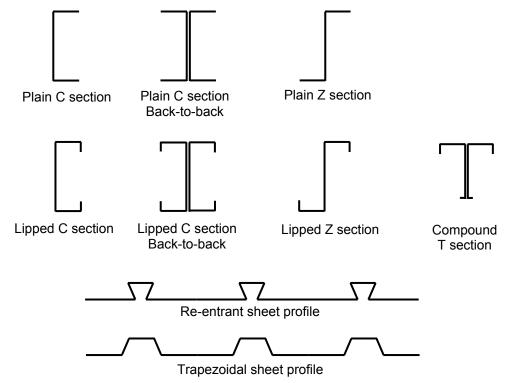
Typical cold-formed steel open sections and sheet profiles
